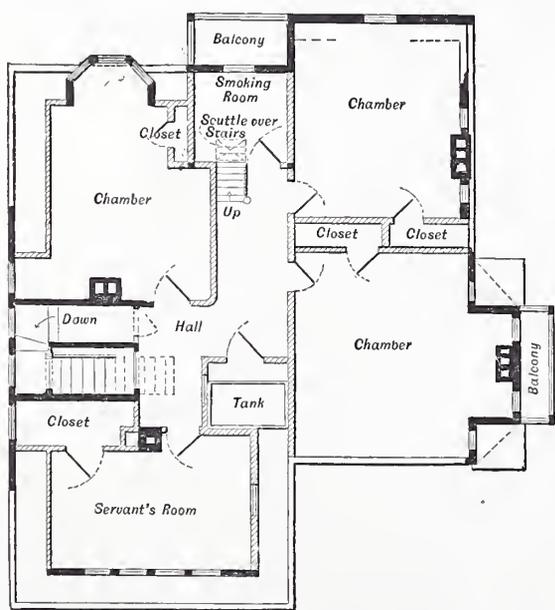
Attic Plan.—Scale, 1-16 Inch to the Foot.
